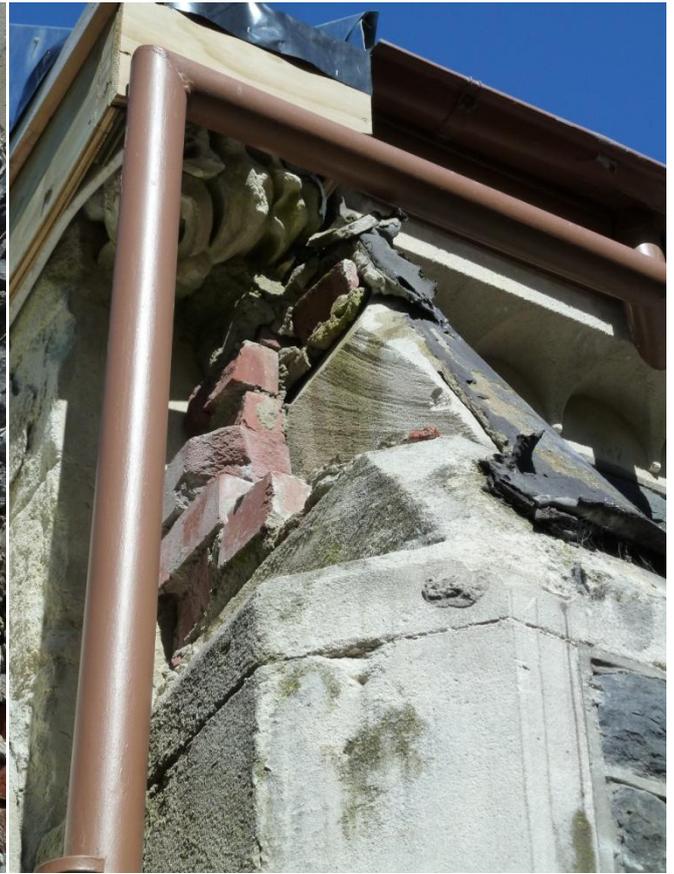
Top of buttress suffered from damage and removal of facade stone
